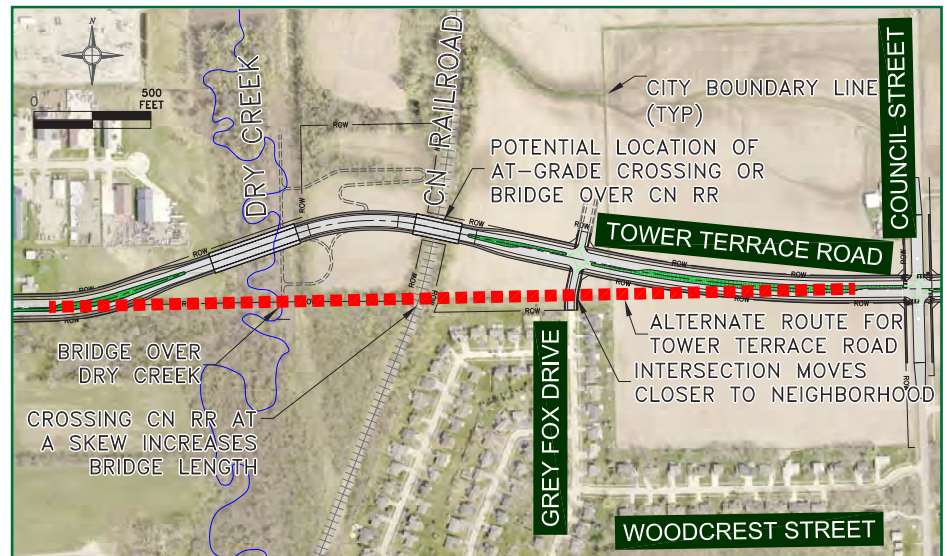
Tower Terrace Road Alternative Alignment at Railroad Crossing; Aerial: Linn County, 2018
